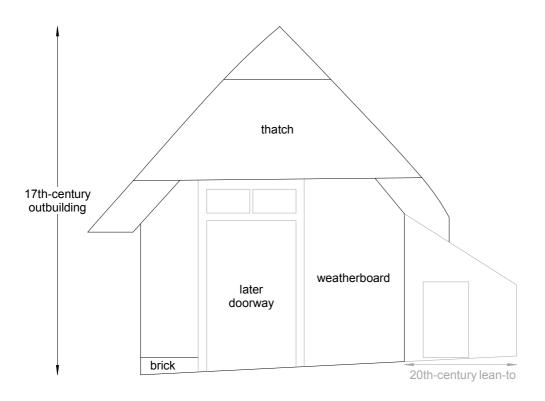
West elevation of structure 5 (17th-century outbuilding), with alterations shown grey.
